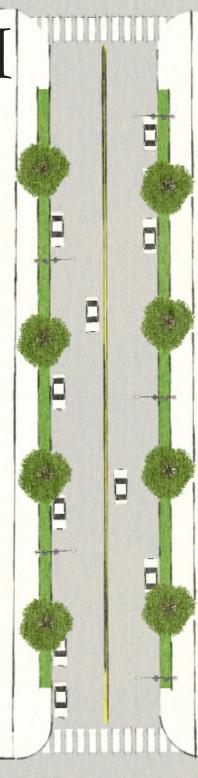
Recommendation from the Southeast Baltimore Complete Street Plan ³³
